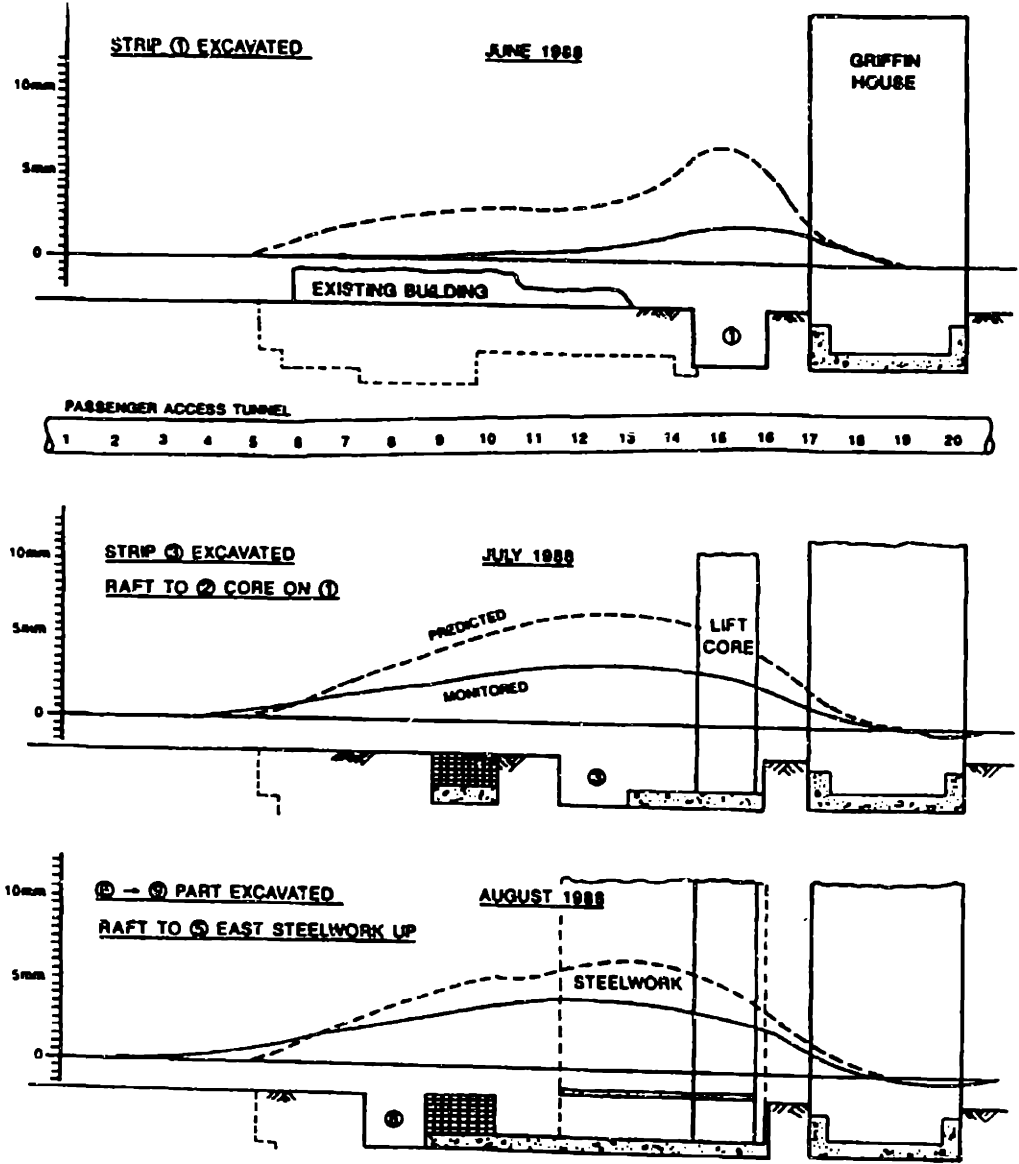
Comparison of predicted and measured heaves during demolition, excavation and construction of the Grand Building (Clayton, et al., 1991).
